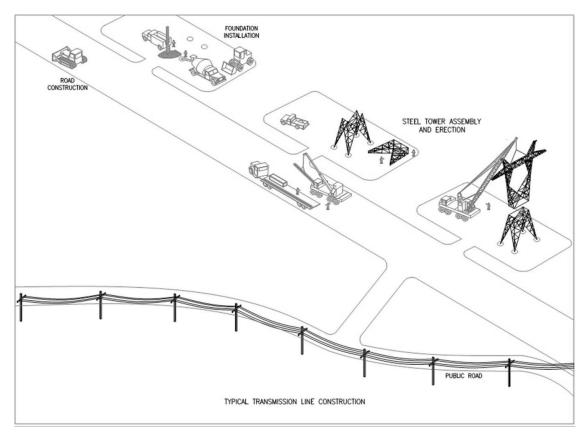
Foundation Installation, Tower Assembly and Tower Erection
